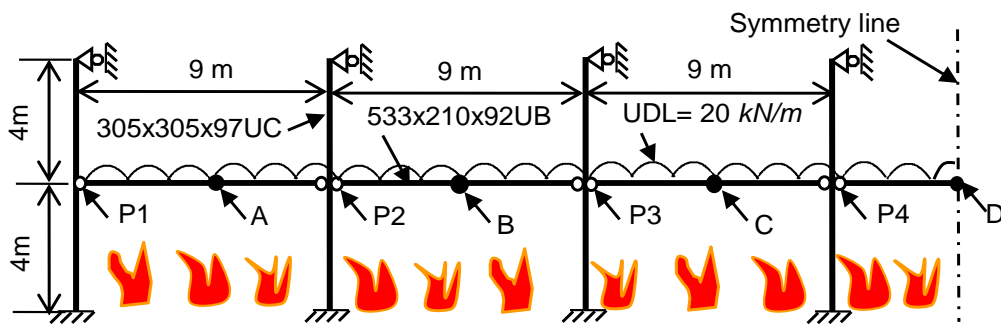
Two-dimensional steel frame subjected to whole floor fire
